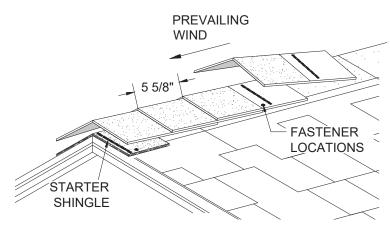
Placement and Fastening of RidgeFlex® Shingles, Maintaining the 5% Exposure
